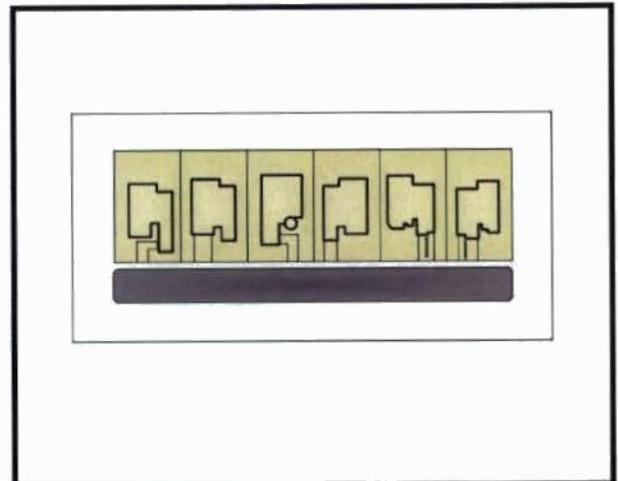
Façade Articulation Exhibit demonstrates a "staggered" street profile.
